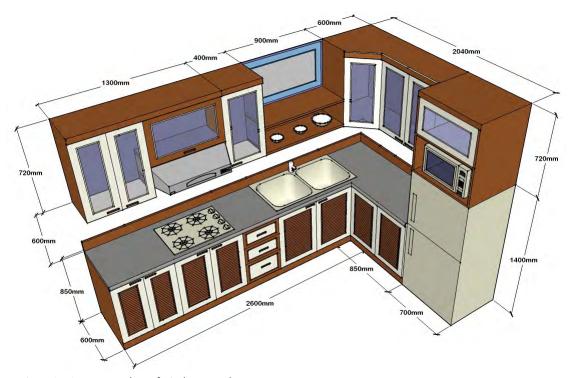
Layout Plan of Kitchen Work zones
